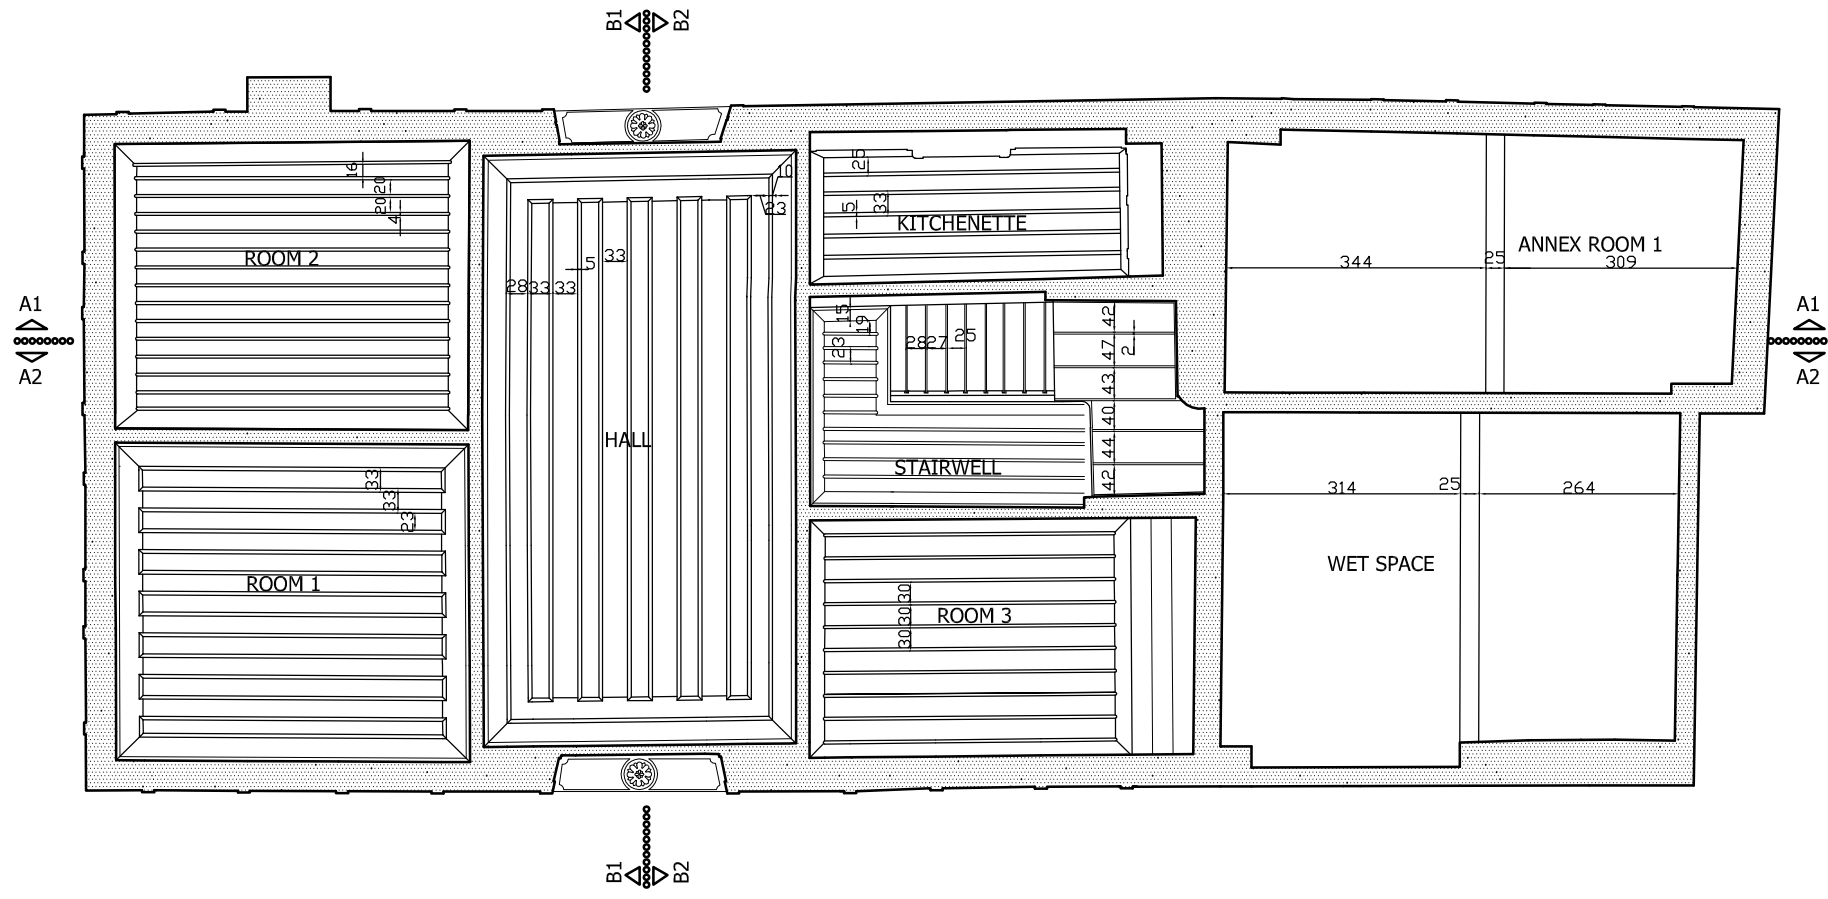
Measured Drawings- Basement Floor Ceiling Plan
